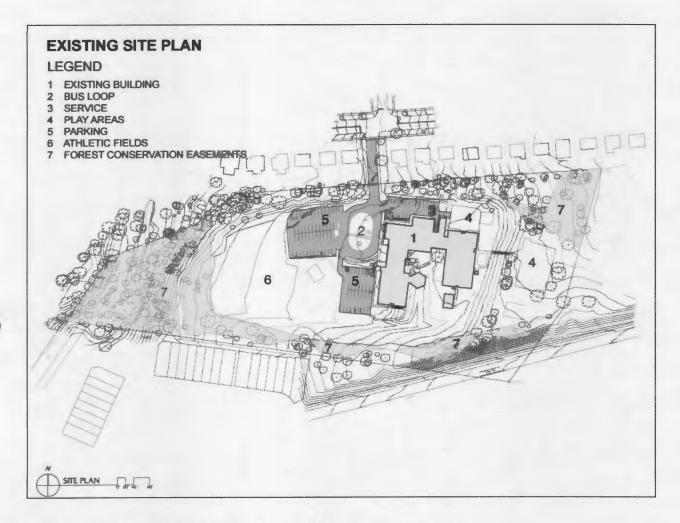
Site plan (Walton, Madden, Cooper, Robinson & Poness, Inc.).
